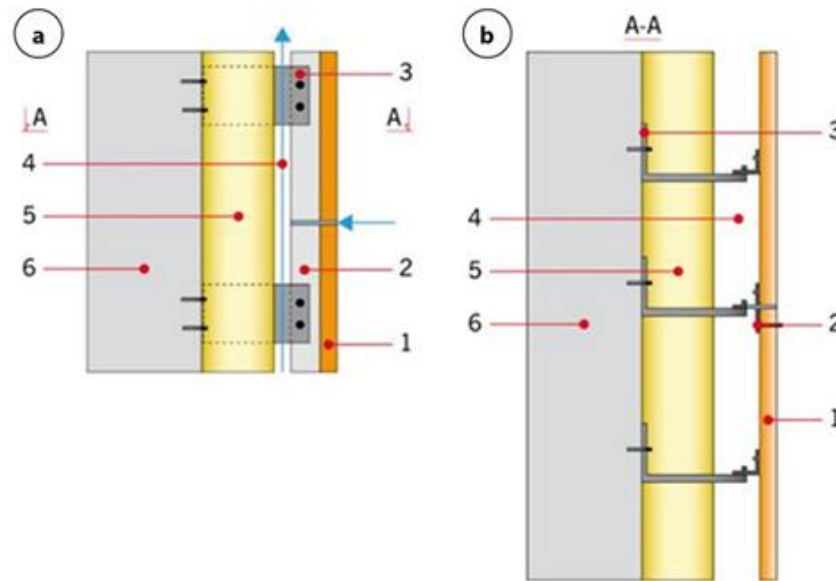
Schematic diagram of a ventilated façade (drawing by the author): a- vertical cross-section; b- horizontal cross-section; 1 - cladding, 2 - profile, 3 - console, 4 - ventilated gap, 5 - thermal insulation; 6 – wall
